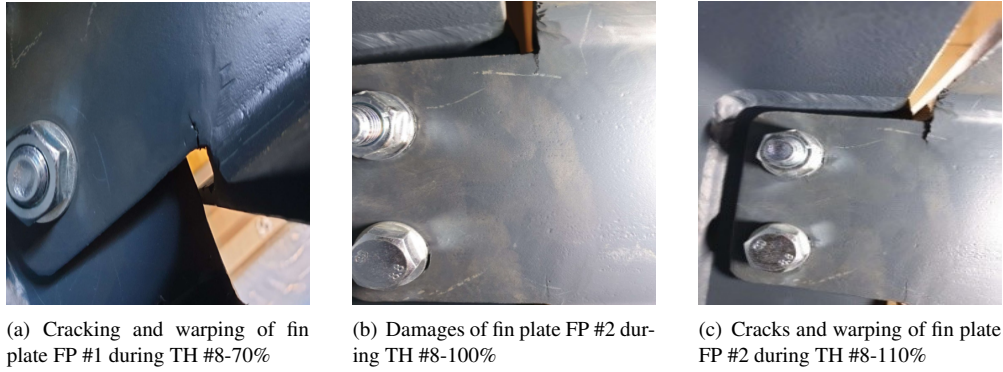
Cracks and warping of fin plate connections between primary MRF beam and secondary crossbeams at the first floor
